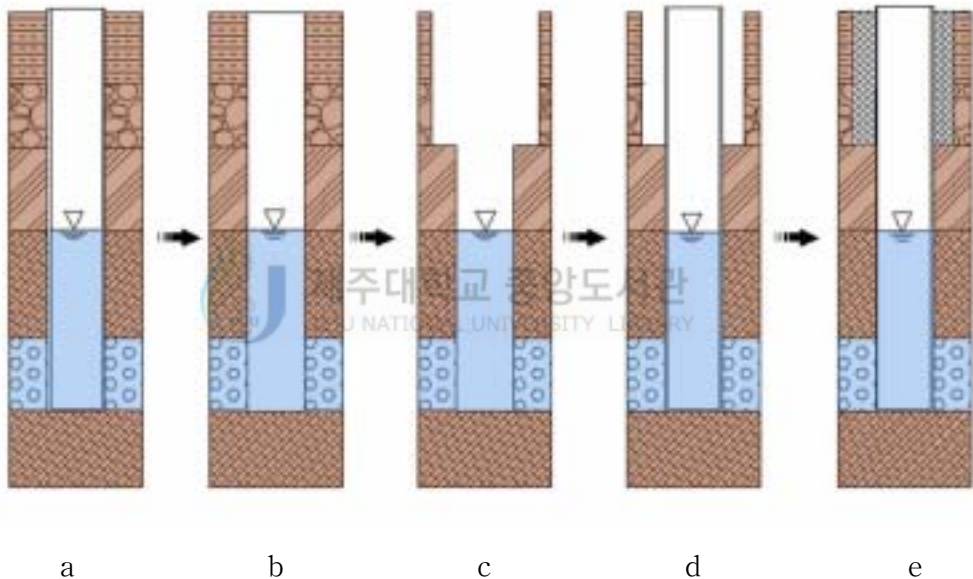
Diagram of grouting technique for surrounding(a: before repairing, b: casing conduct, c: widening a well d: installing casing, e: grouting of surrounding gap)
